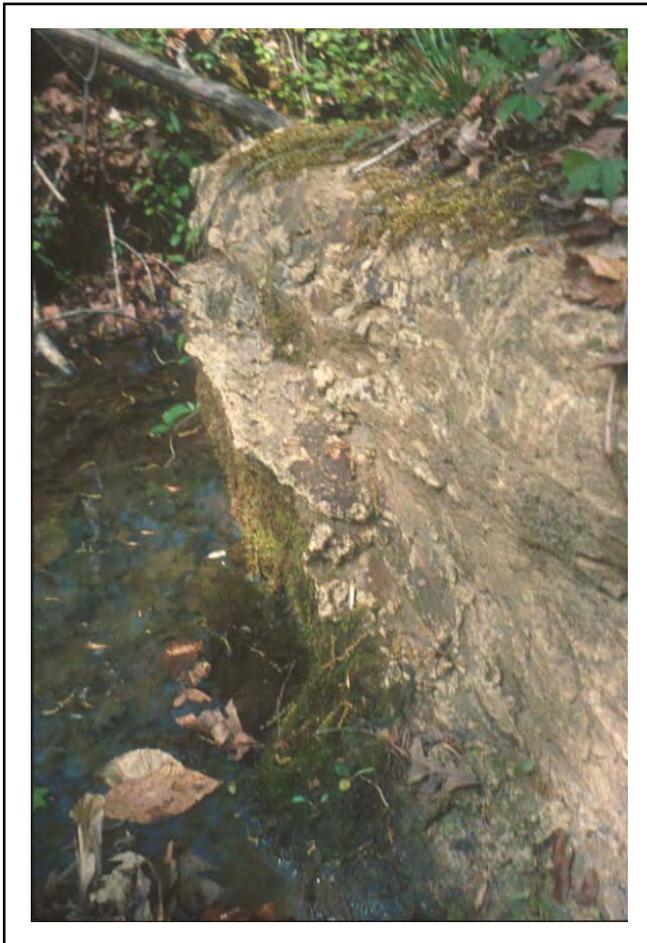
Close-up of north end of HR-2 concrete dam showing flare at base.
